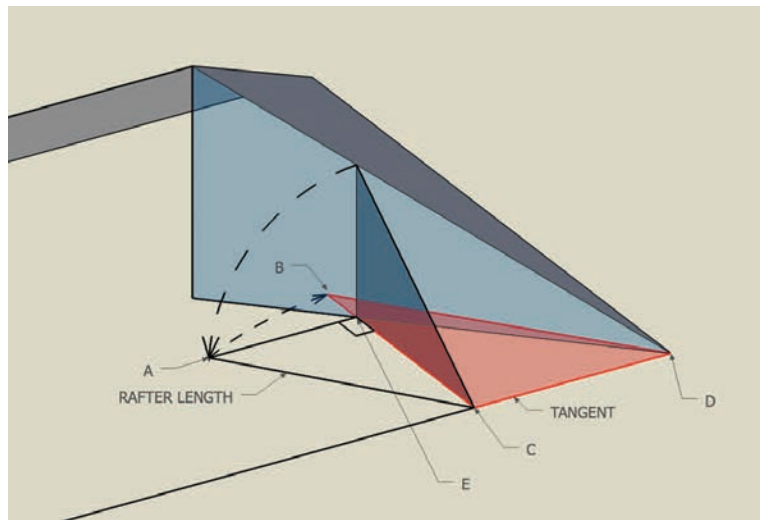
Producing the tangent plane starting in plan view requires laying out jack rafter triangle and translating resulting rafter length to meet an extension of rafter run.
